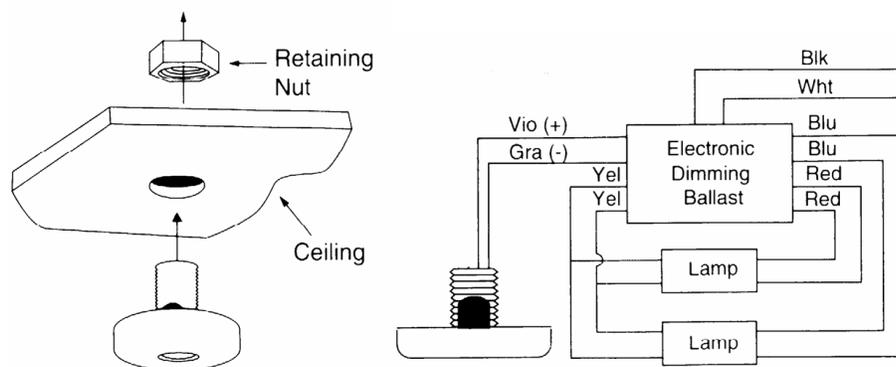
Wiring for a Ceiling Mounted Light Sensor
